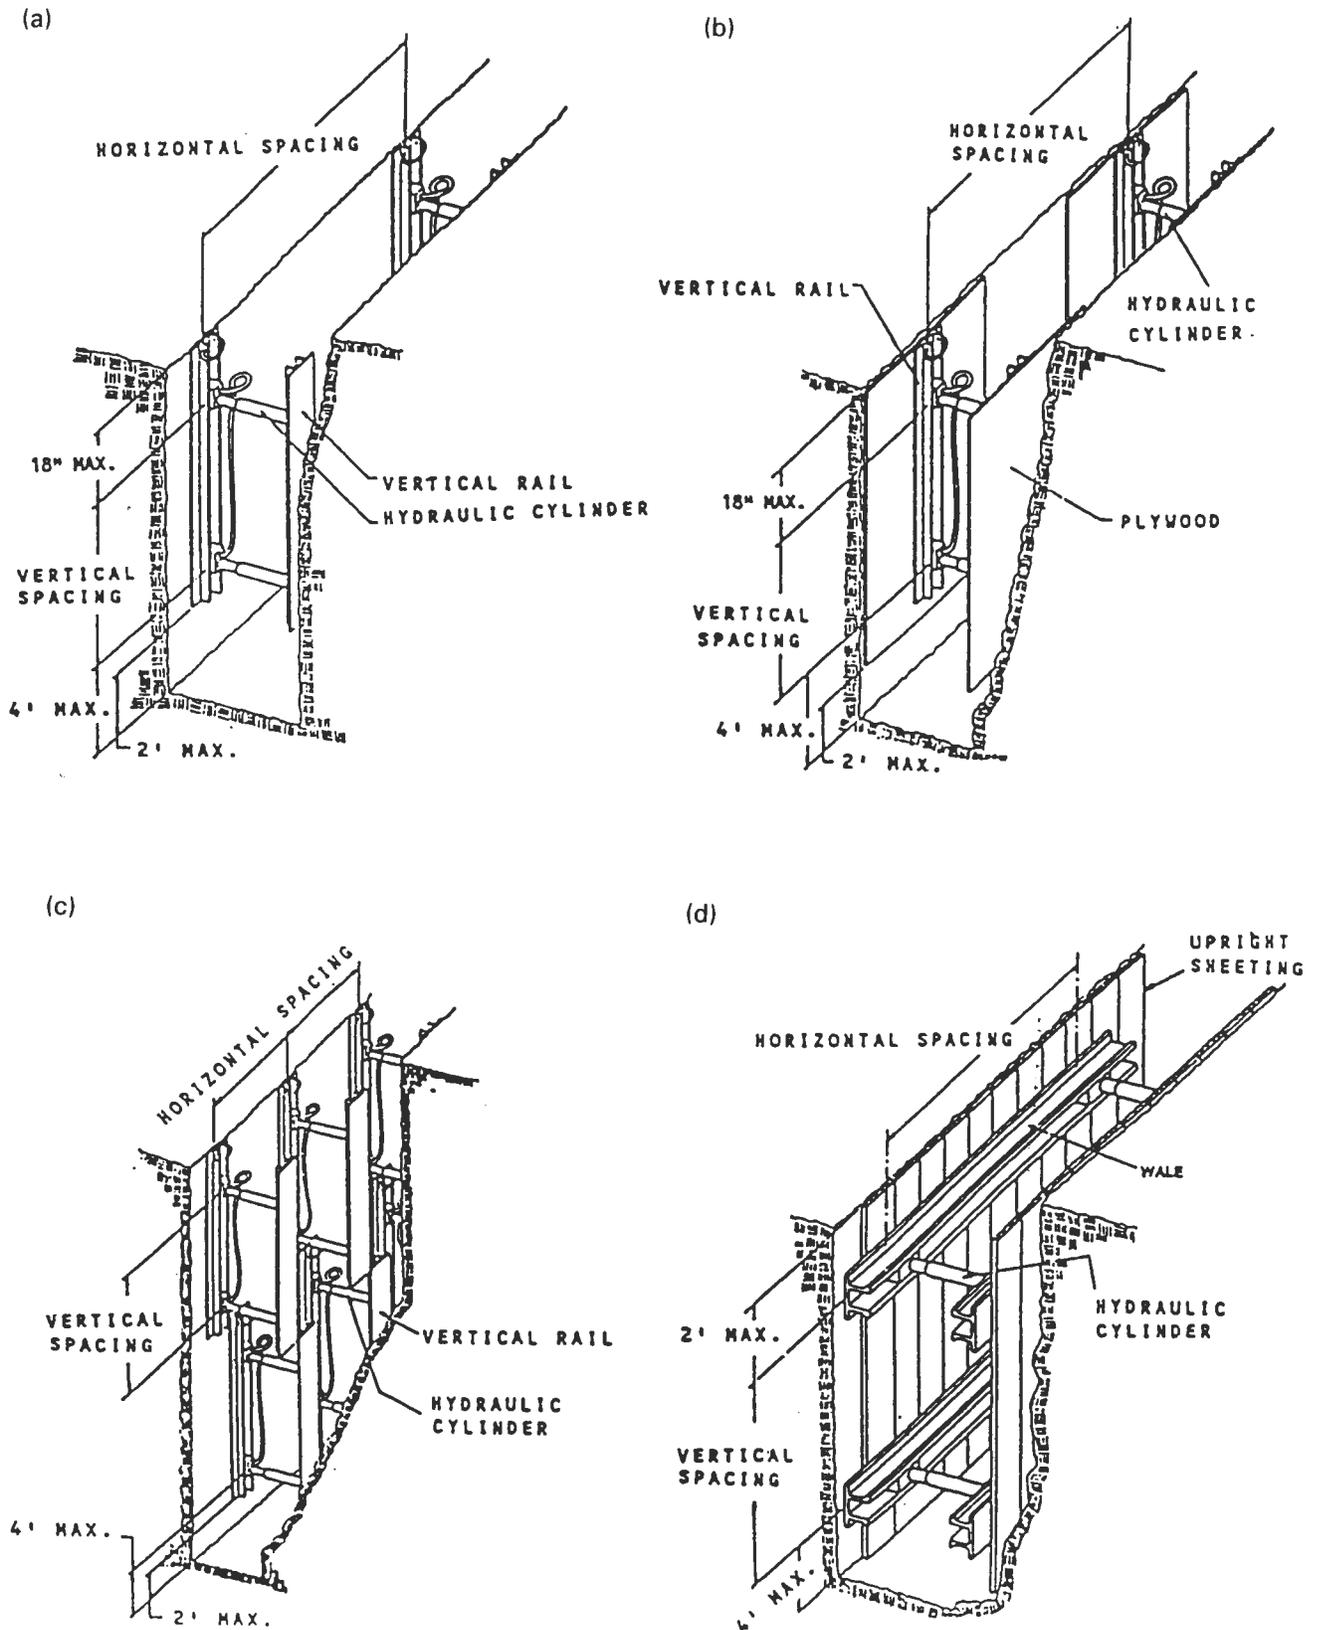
Typical installations of aluminum hydraulic shoring: (a) vertical shoring (spot bracing), (b) vertical shoring with plywood, (c) vertical shoring (stacked), (d) typical wale system.
